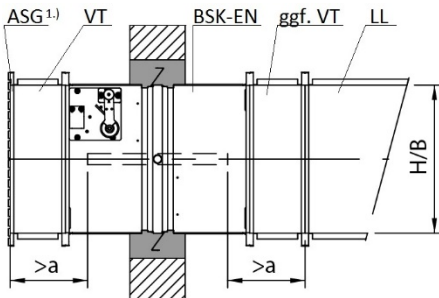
Connection example of a ventilation duct arranged on one side and a finishing protective grating
